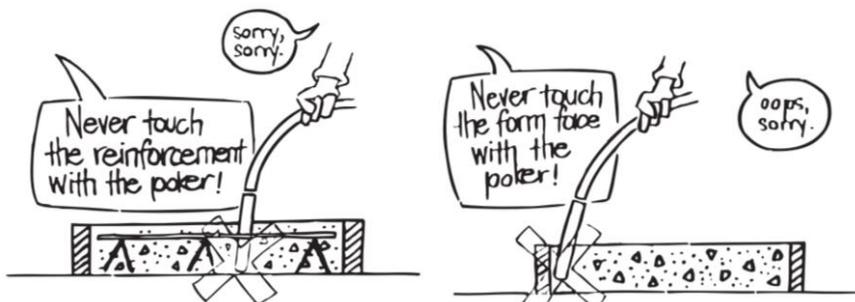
Do not touch reinforcement or formwork with vibrator
